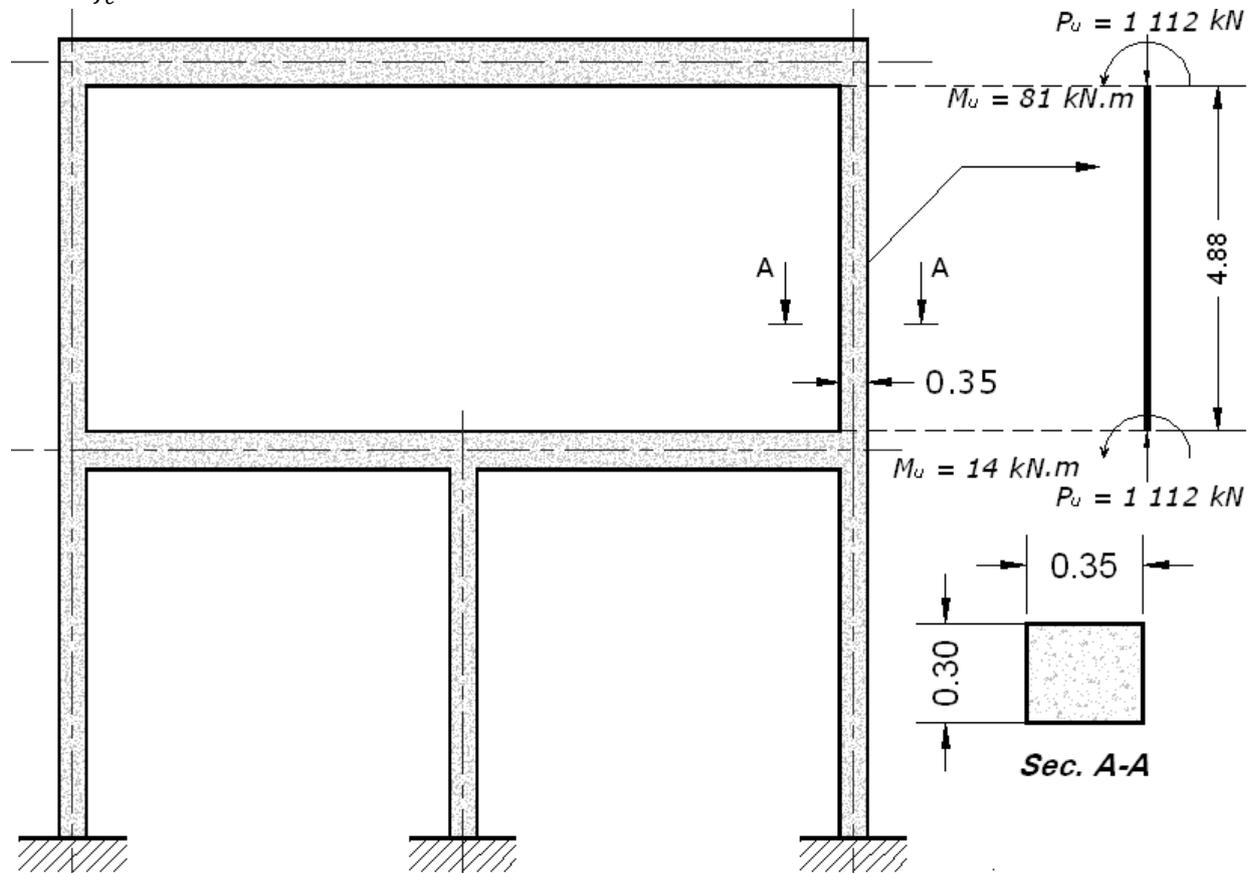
Frame and column forces for Example 10.3-1.
